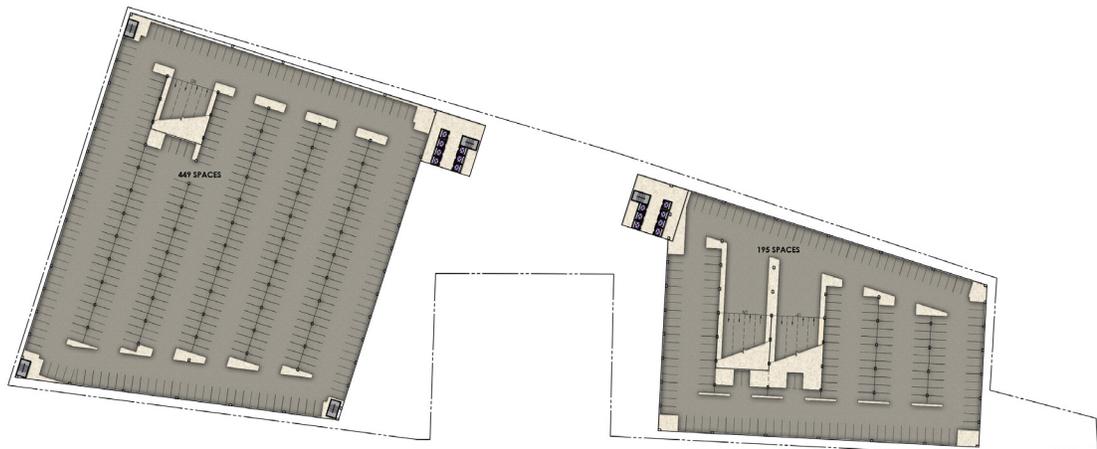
a-42 Alternate Parking Structure Plan - Garage Grade Level 10 Plan
